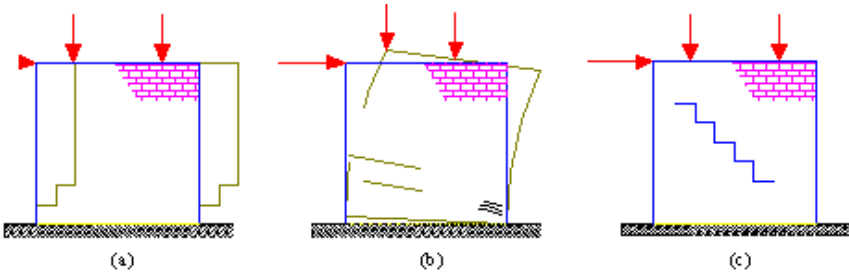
Collapse patterns in horizontal and vertical load-bearing walls (Çöğürçü, M.T.)
